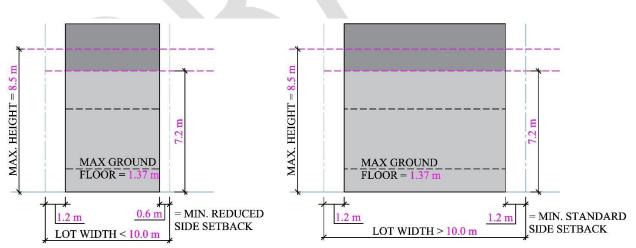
K.F10: Parallel Massing on Pitched Roof Building – Front Elevation
